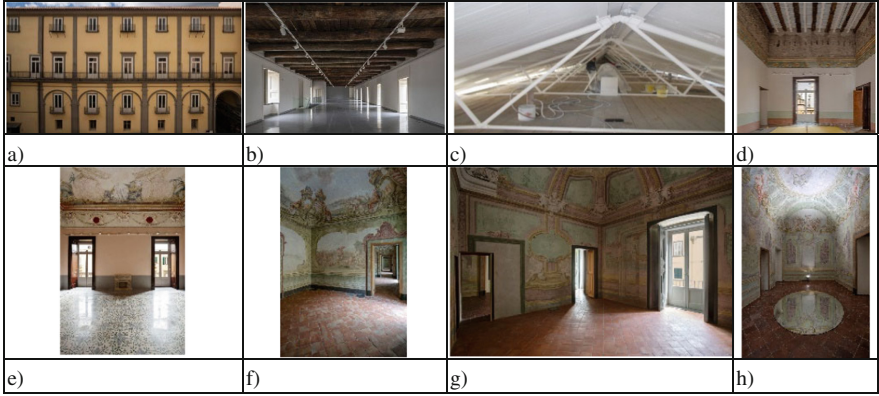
a) The building East façade after restoration (fondazionemorragreco.com); b) the old timber beams in the upper hall (atribune.com); c) the new roof trusses; d) the ceiling of one of the halls (fondazionemorragreco.com); e, f, g, h) Some halls after restoration (fondazionemorragreco.com).
